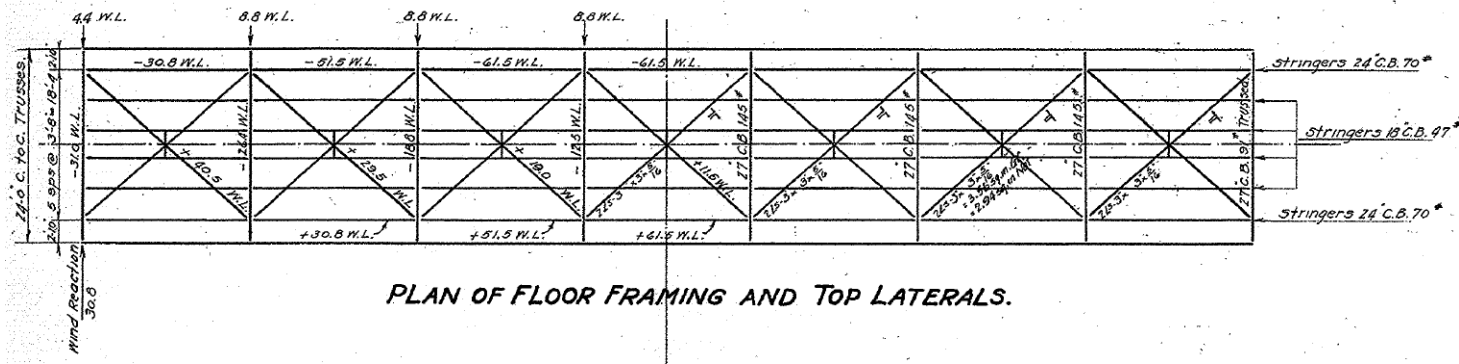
Dimensions and design loads for floor truss members, stringers, and top lateral braces. J.G. White Engineering Corporation (1928). Used under fair use, 2015.
